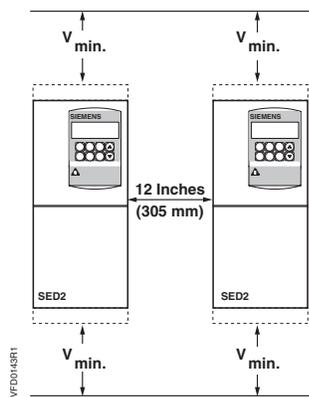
Mounting Dimensions of NEMA Type 1 SED2 in Inches (Millimeters).
